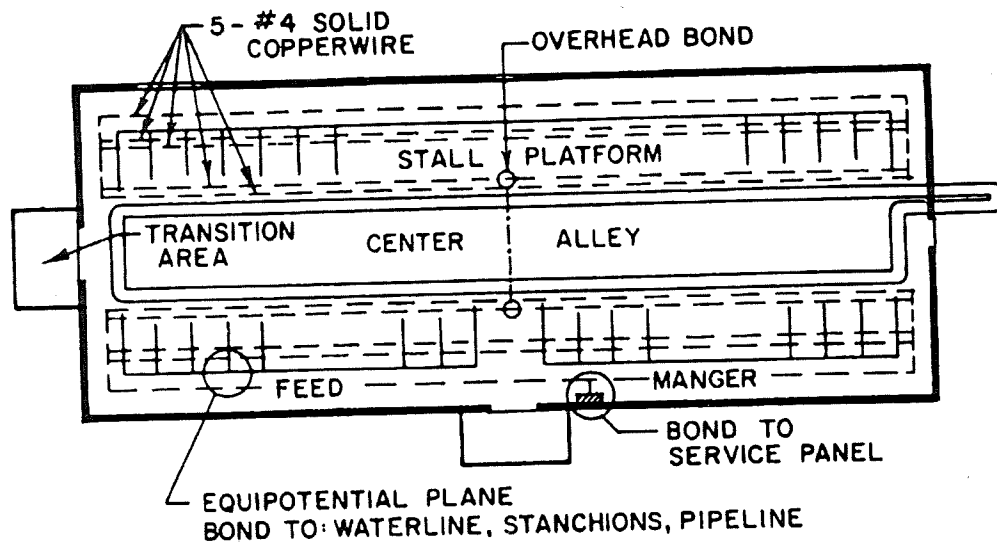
Retrofit equipotential plane in stanchion/tye stall barn.
